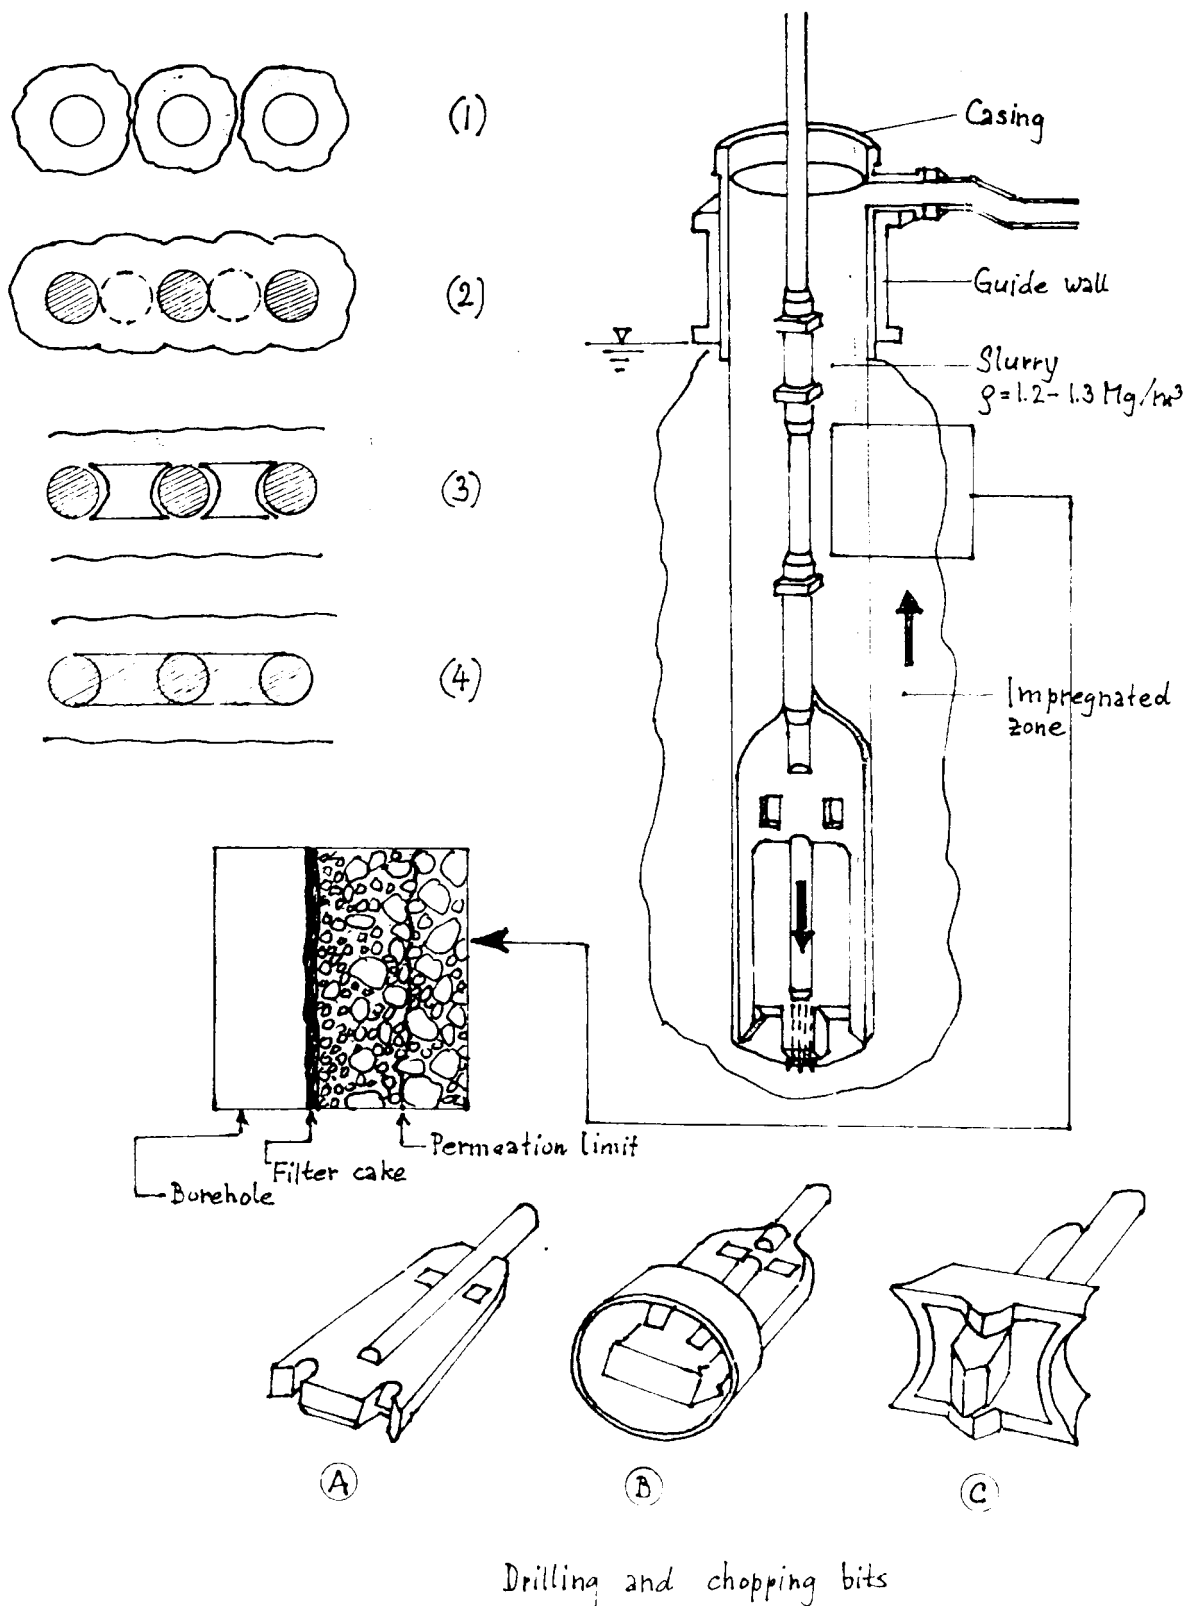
Steps illustrating the construction of an I-C-O-S pile wall
